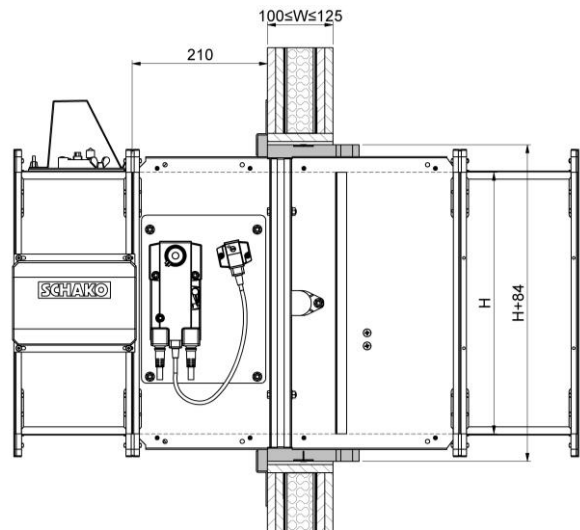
Dry installation in lightweight partition wall (F90) $W \leq 125$, with ER-A1 installation frame
